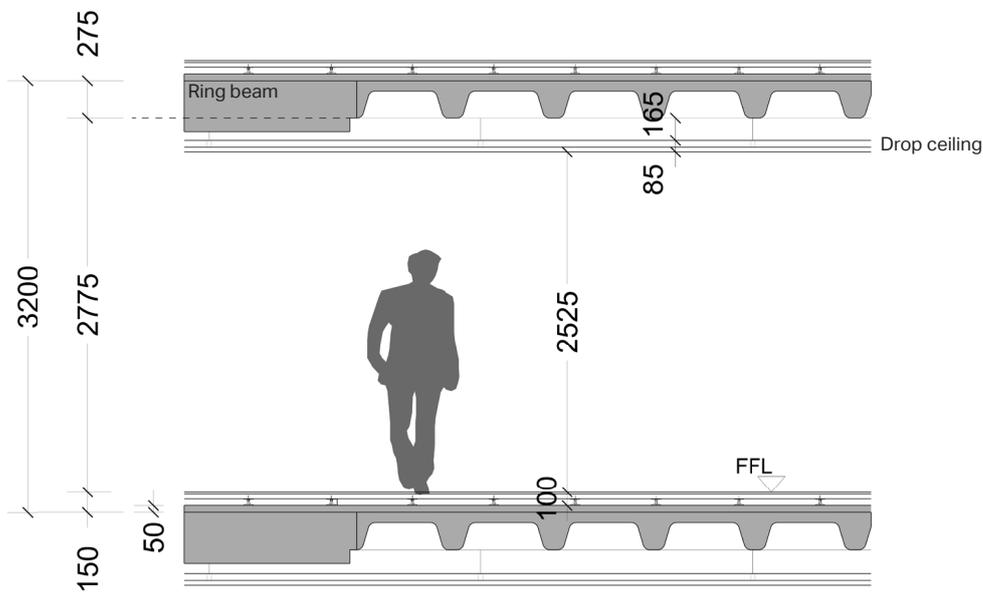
Diagram showing erosion of floor slab due to upgrades to meet current Building Regulations
